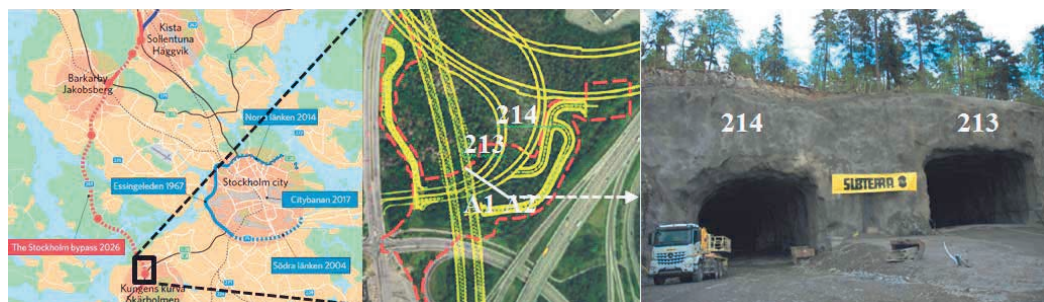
Access Tunnel and underground garbage collection depot (Karlsson 2014).
